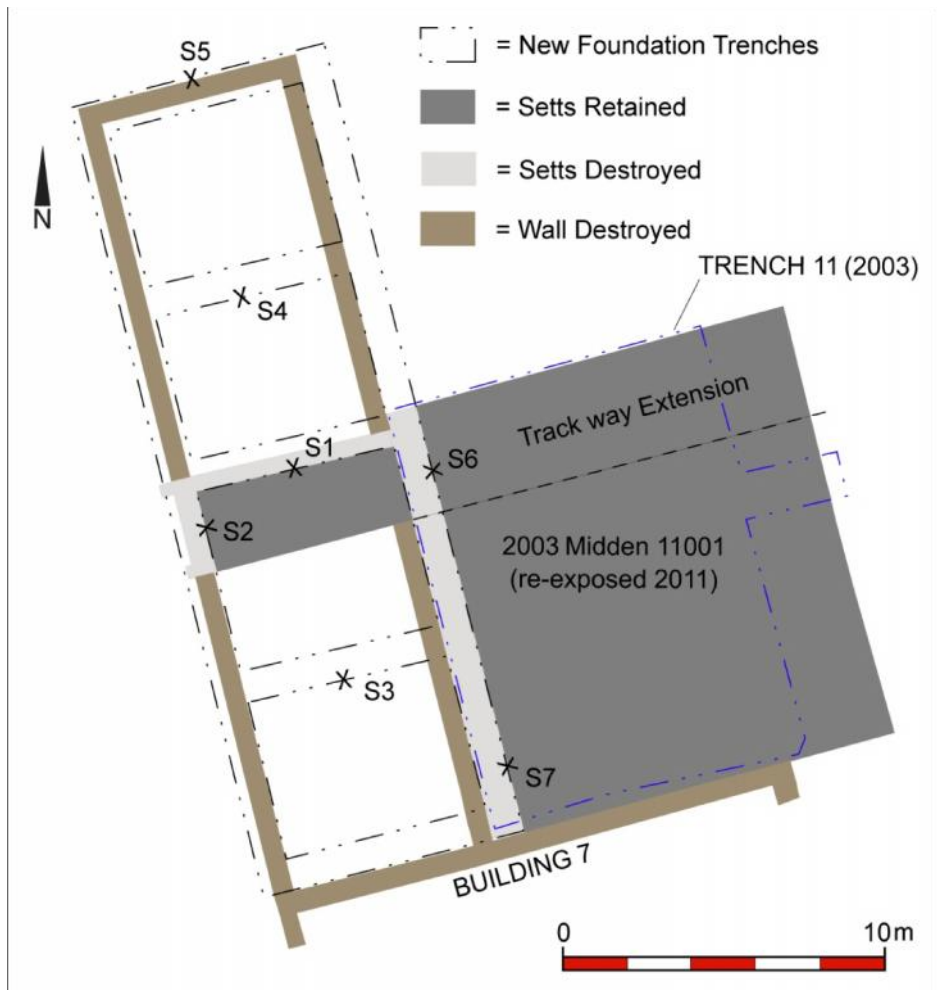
Locations of new foundation trenches and damaged areas.
